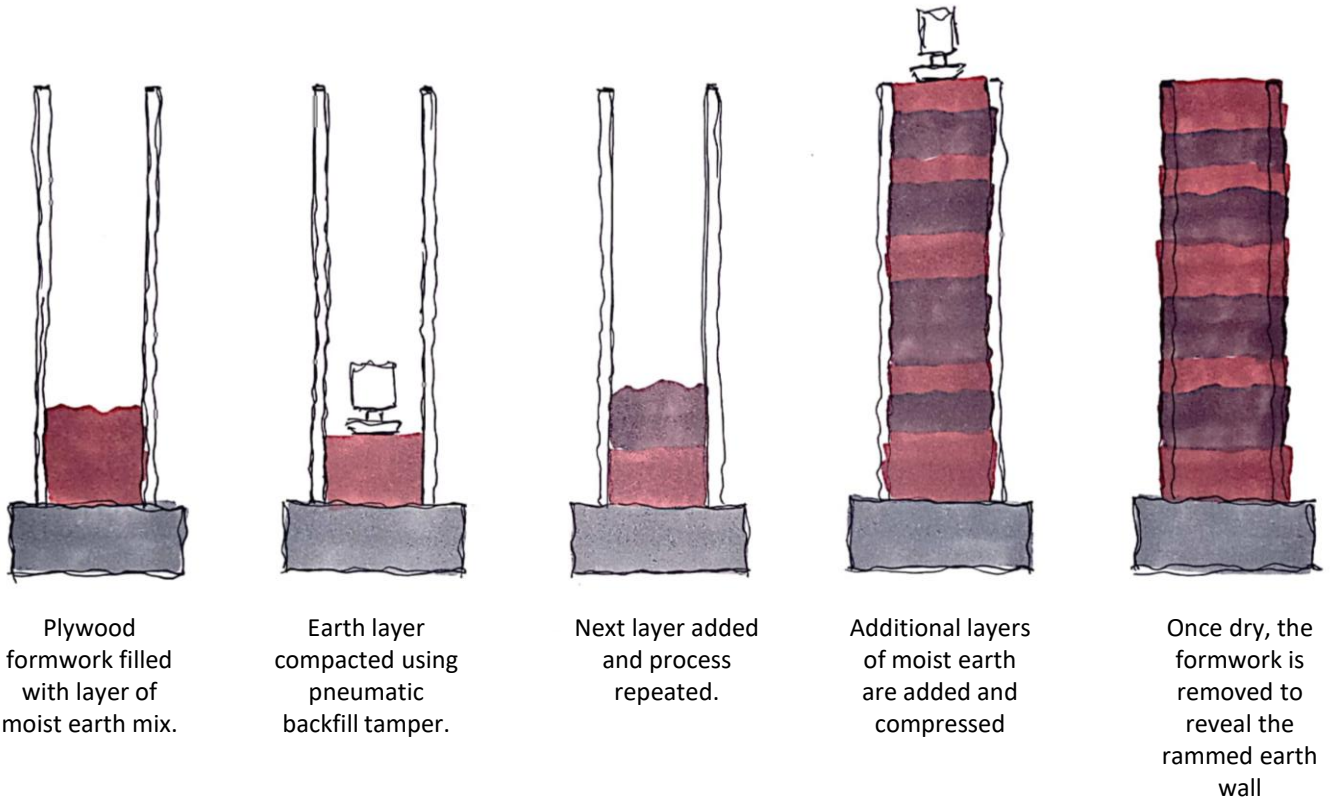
Rammed Earth Walls (PKBN, 2016: online)
